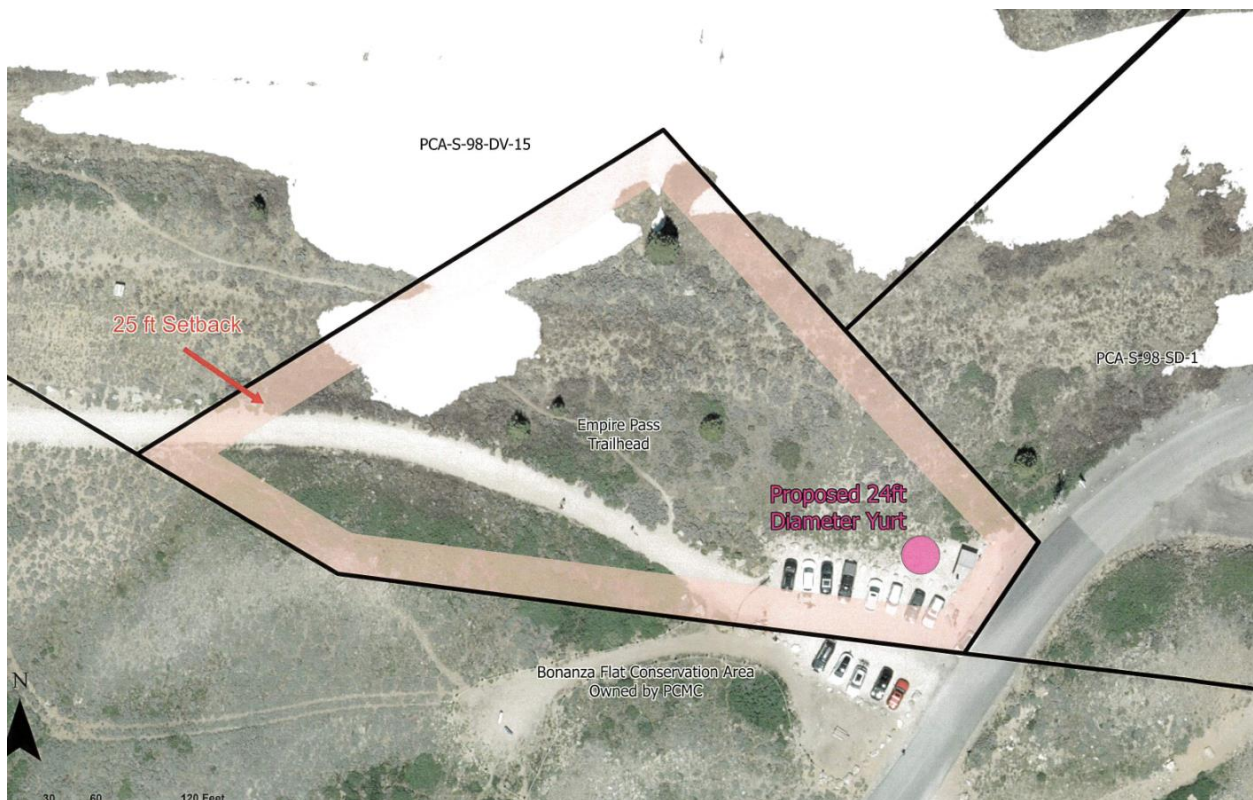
Location of Ski-related Accessory Building at the Empire Pass View Area site plan from Applicant
